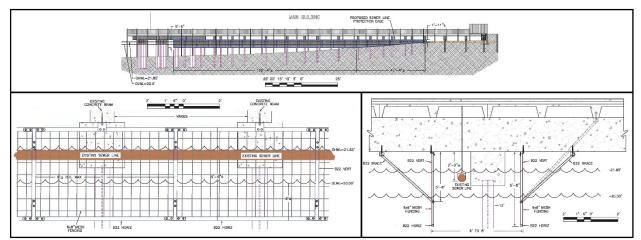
Drawing of the planned sewer line protective fencing (Adapted from Sheets 6 & 7 of 7 in Waterfront 2021a, and Sheet 6 of 11 in Waterfront. 2022b).
